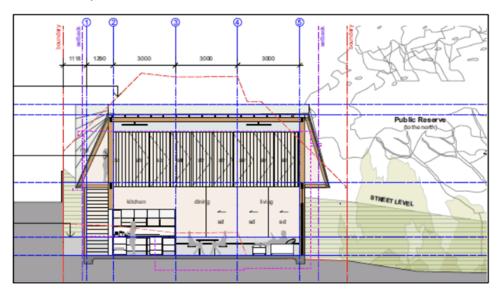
Section showing breach of building envelope control at north-eastern end of roof form
